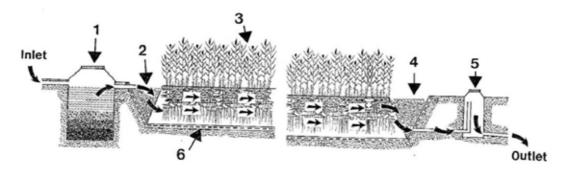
Typical arrangement of a Danish reed bed constructed according to the root-zone concept. 1. Sedimentation tank; 2. Stone-filled inlet distribution trench; 3. The common reed, *Phragmites australis*; 4. Stone-filled outlet collection trench; 5: Outlet regulation well. From Brix (1987b).
